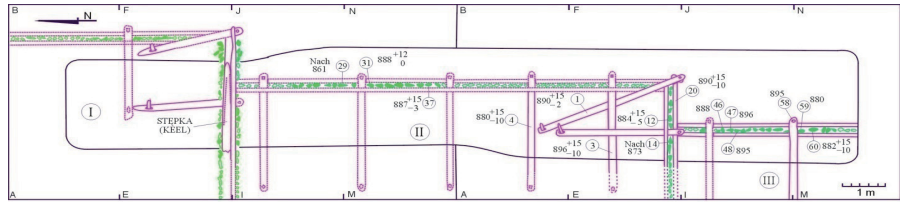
Top view of the reconstruction of a quay wall in Wolin Poland, ca 800 [Navis]
